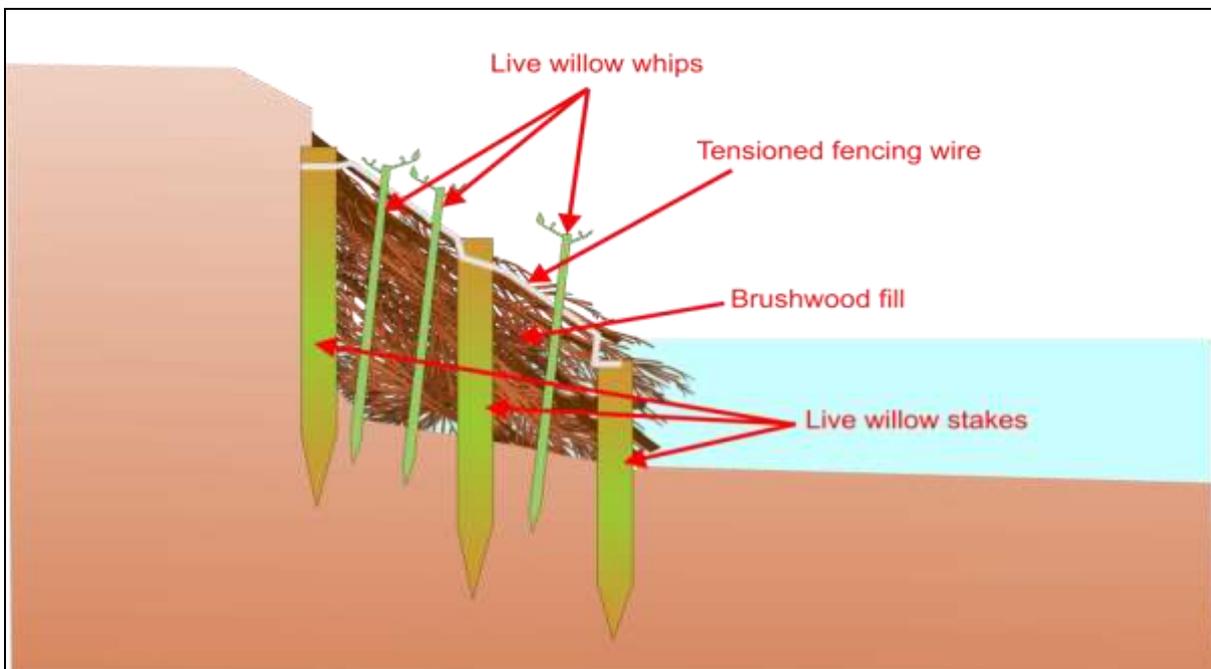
A cross section illustration of a brushwood erosion protection installation with live willow
